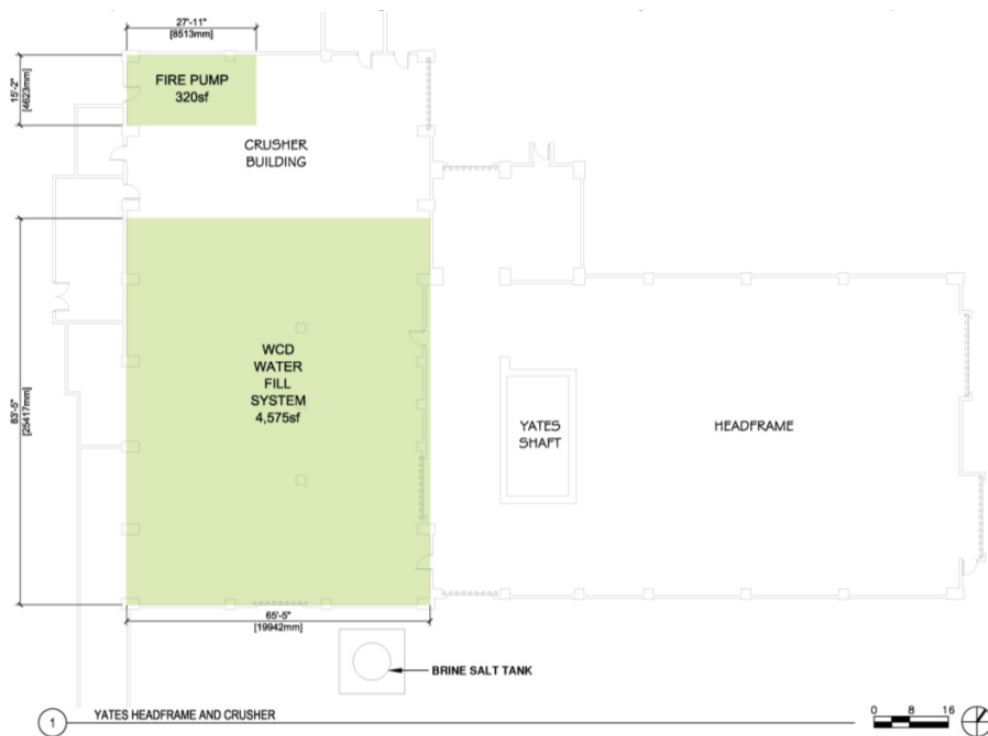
Yates Headframe and Crusher architectural plan. (HDR)
